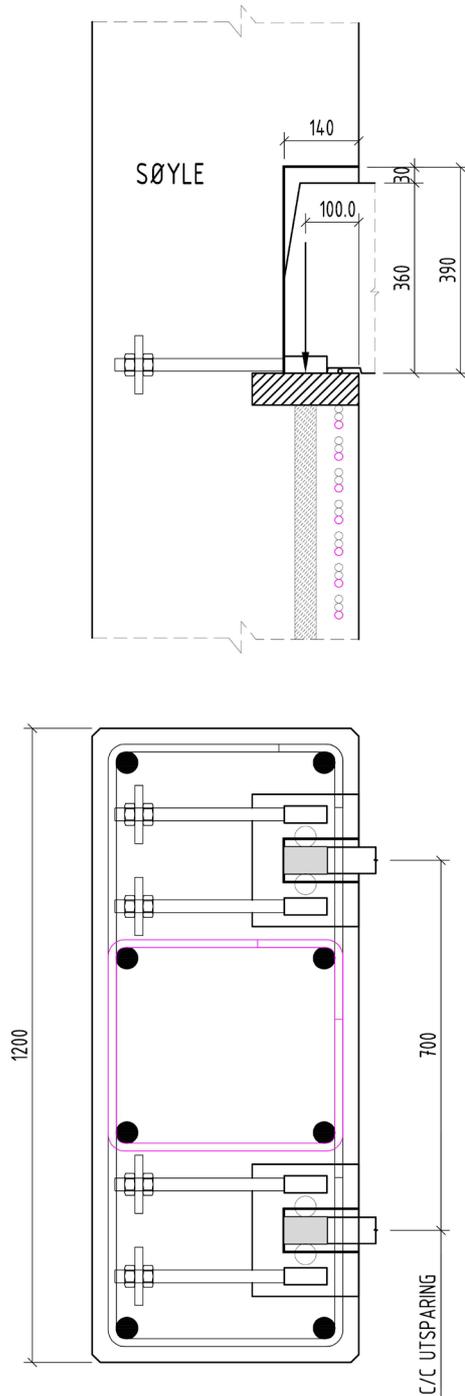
BSF1100 column unit. (Reinforcement is not illustrated complete.)
